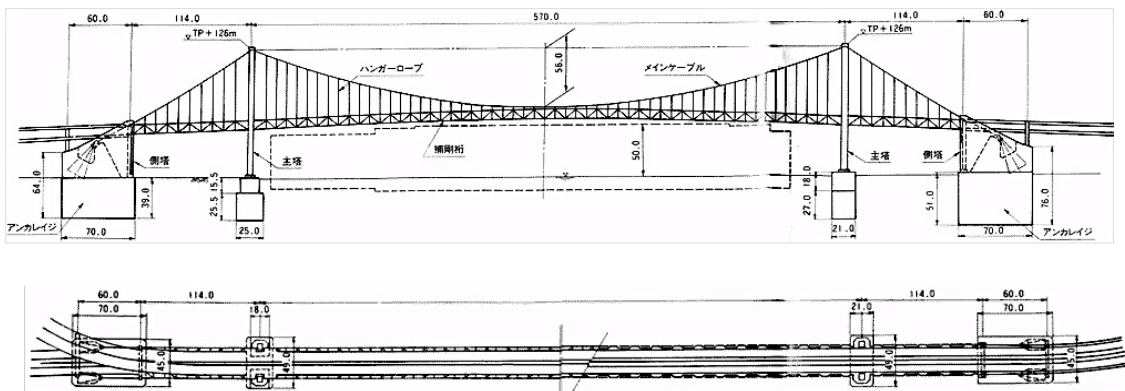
Side and Plan view of the Tokyo Rainbow Bridge [39].
